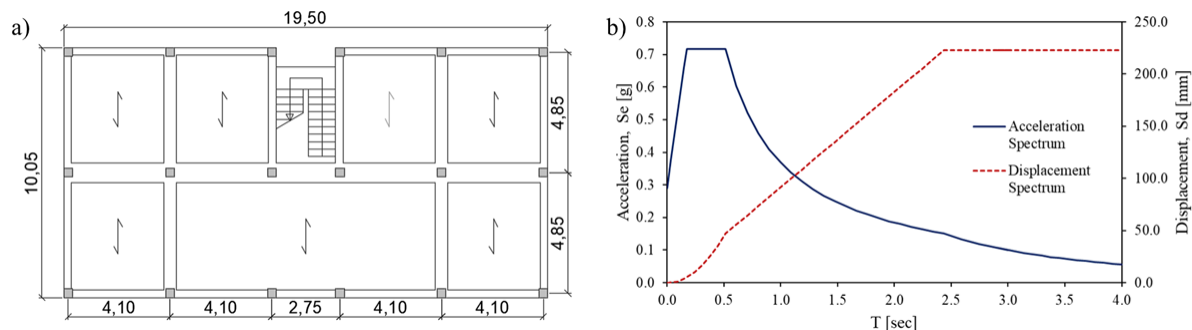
a) Plan view of the selected case study building. Columns are 35x35cm at the first two stories and 30x30cm at the last two, perimetral beams are 30x50 cm, the hidden beam in the longitudinal direction is 80x20cm, while hidden beams in the transversal direction are 50x20cm. b) acceleration and displacement spectra at the Life-Safety Limit-State (LSLS) for the site of interest (Peak Ground Acceleration, PGA = 0.291g, and Soil Class C).
